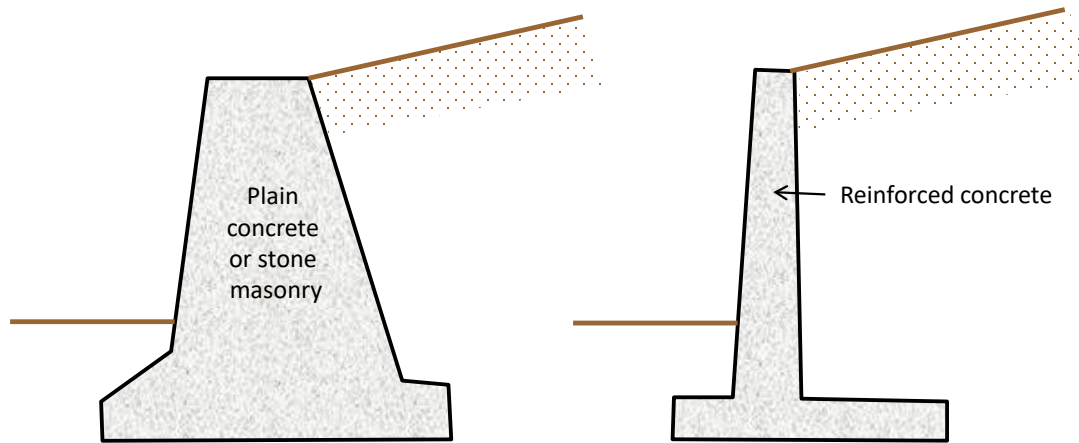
CROSS SECTION OF GRAVITY (LEFT) AND CANTILEVER (RIGHT) RETAINING WALLS. ADAPTED FROM (DAS, 2007).
